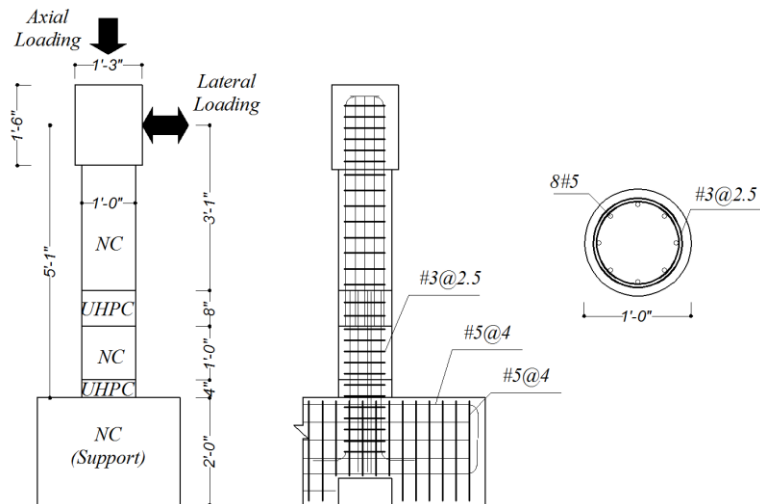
Specimens S-2.5-10, S-4-10, S-2.5-20 typical dimensions and reinforcement details.
